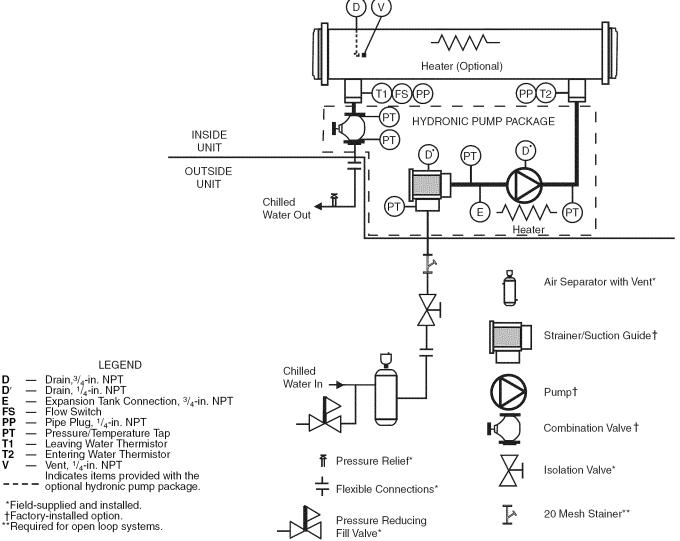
Typical Piping Diagram on 30RB Units with Hydronic Package — Single Pump
